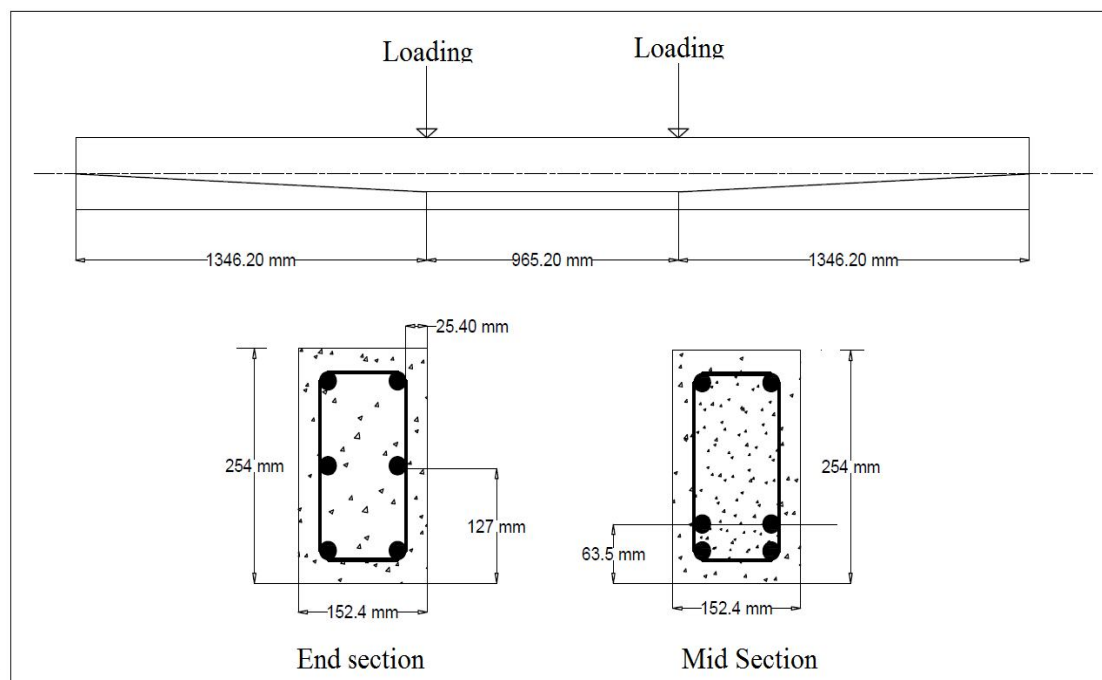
typical detail for post-tensioned concrete beams (Kim, U., et al. 2010.)
